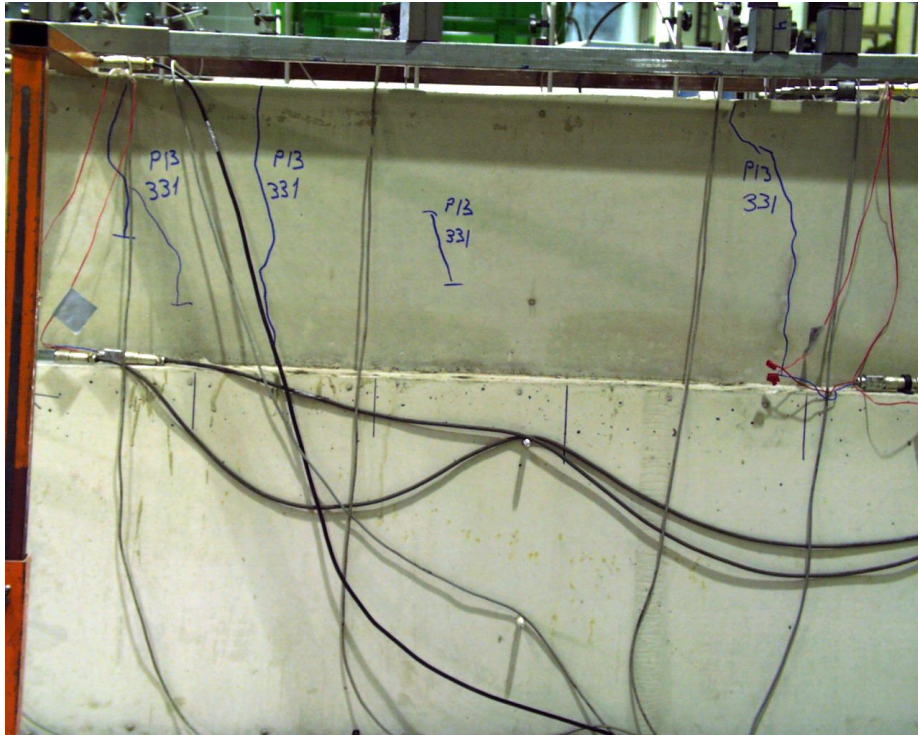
PF400:13. Cracks in tie beam at the loaded end after failure.
